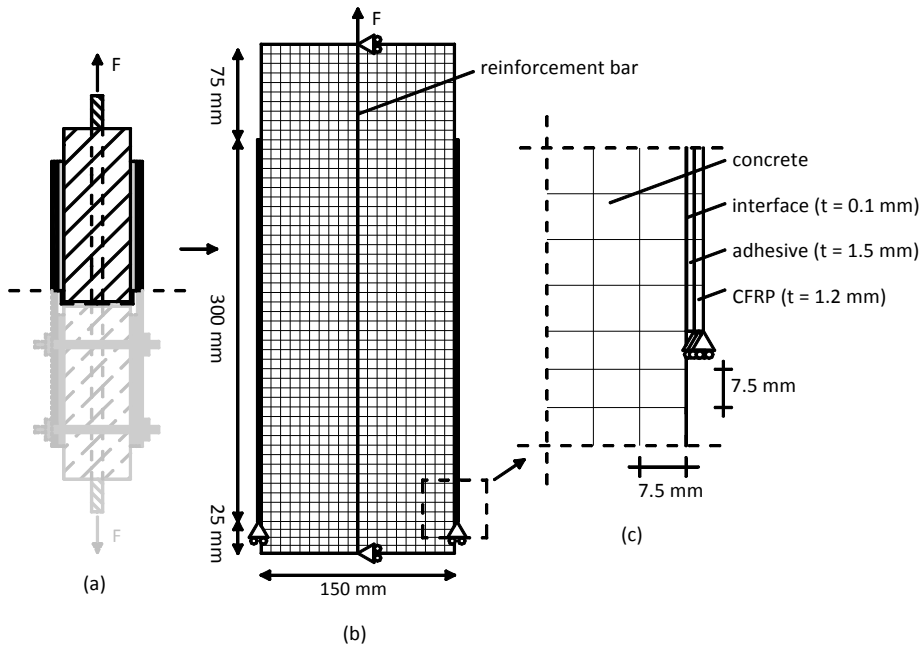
Finite element model of the double-lap shear test specimen (a) test setup, (b) finite element model and (c) detail of finite element model
